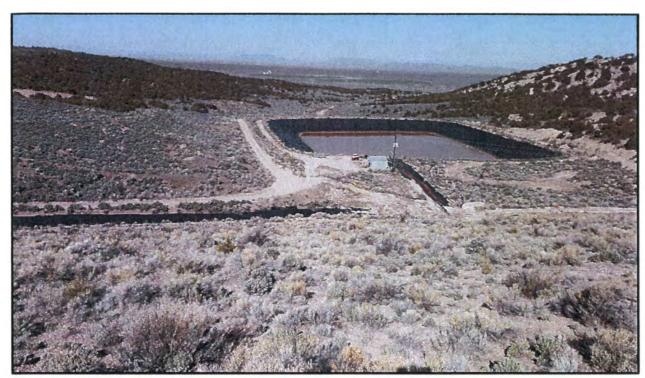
Center of dam crest, looking west across downstream face and seepage collection pond.
